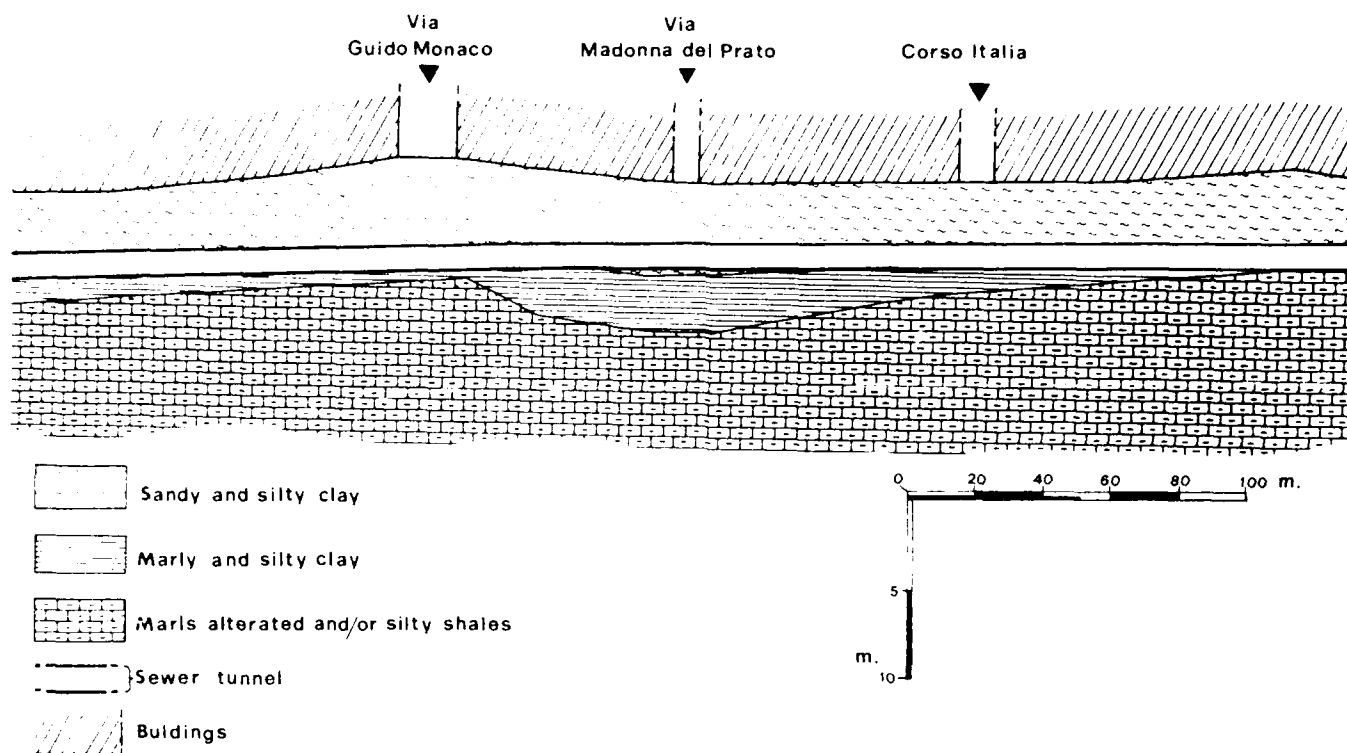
Geotechnical section of the tunnel in the damaged area.
